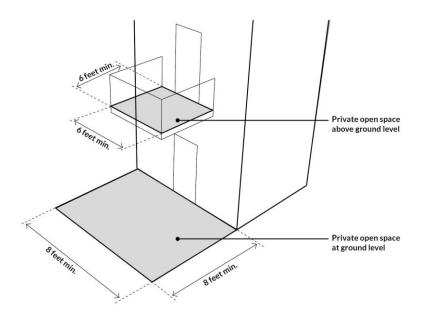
H.3.A: MINIMUM DIMENSIONS, PRIVATE OPEN SPACE
